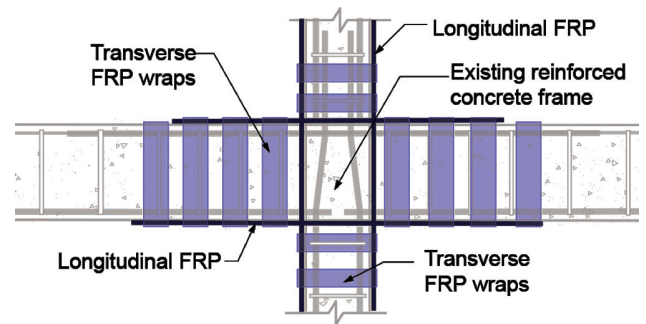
Conceptual FRP strengthening detail (cross section elevation).
